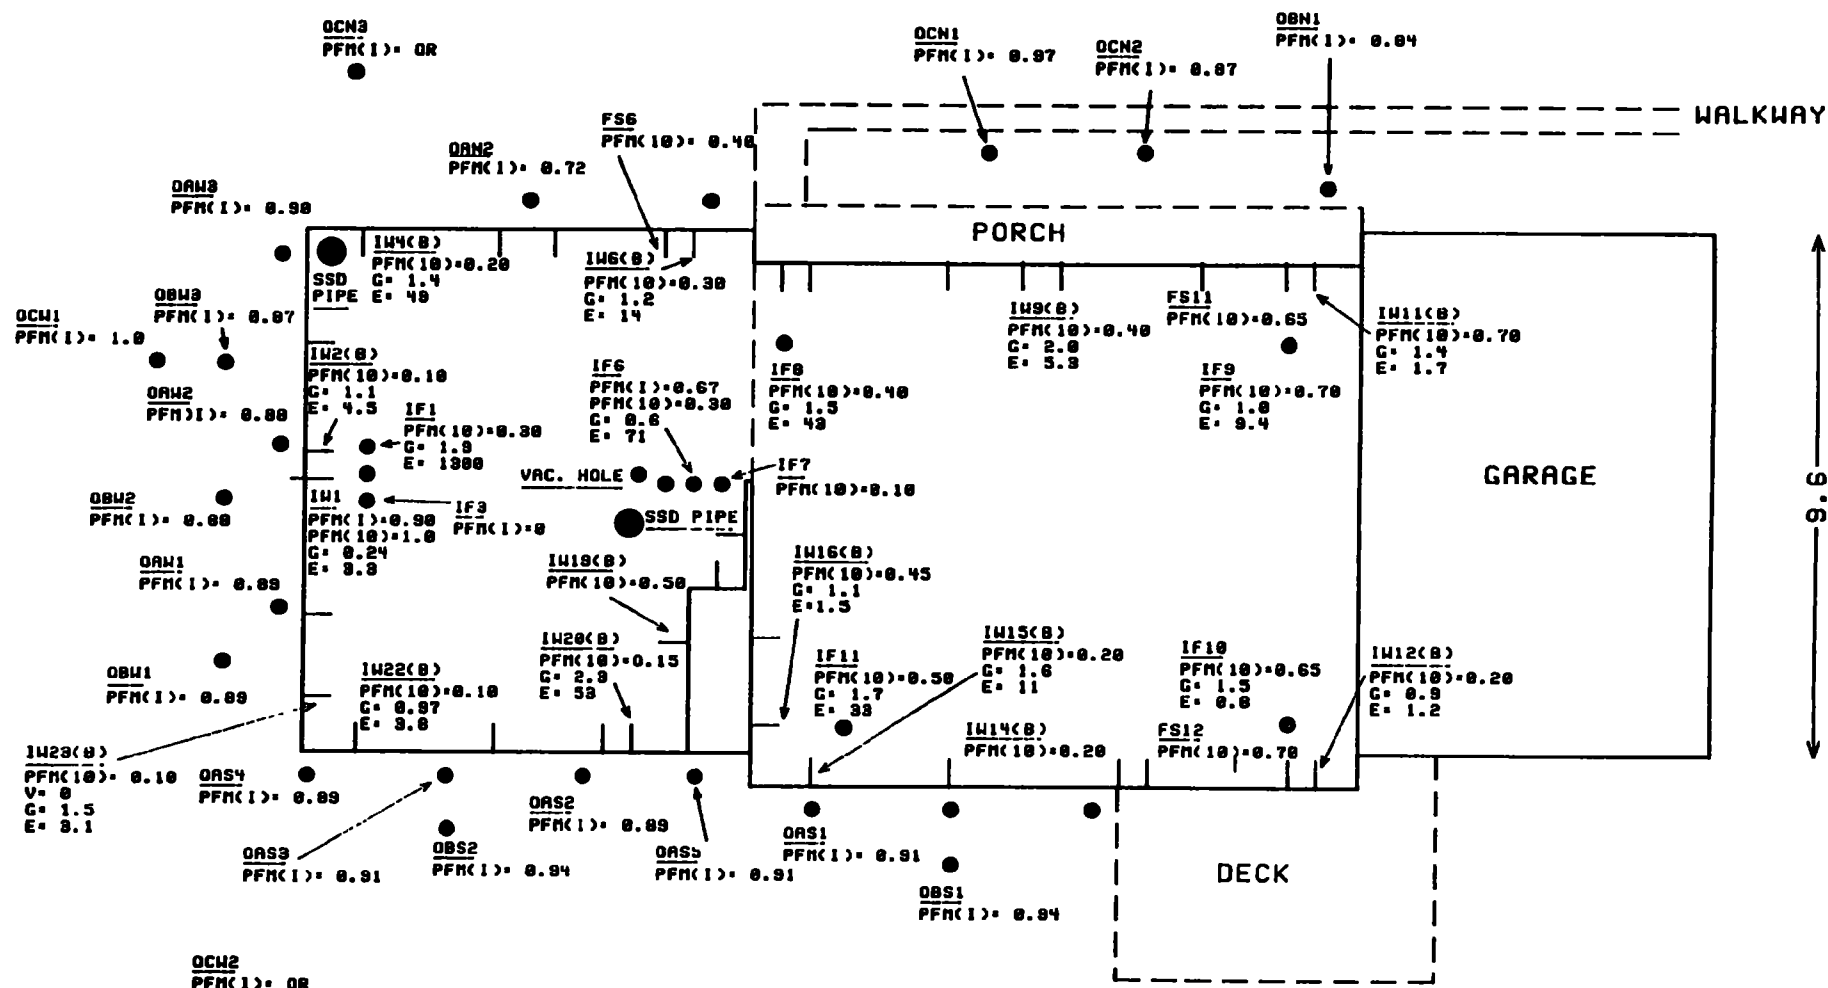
A site plan of house LBL08 that shows the locations of probes in the soil around the house, holes drilled through the slab floors (solid dots), test holes drilled into and through hollow block walls (vertical and horizontal lines), and the pipes for the radon control systems. Data for pressure coupling ratios during pressure field mapping tests (PFM), and for soil gas (G) and radon (E) entry potentials are placed under the identification code for the test holes. See Table 3 for more complete descriptions of the codes and symbols that are used.
